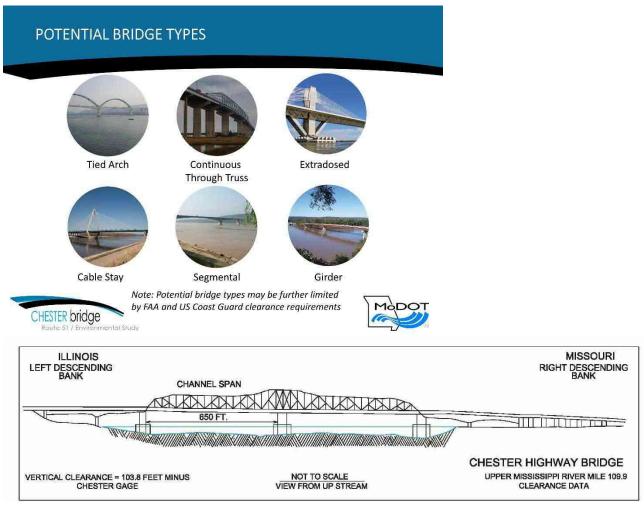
Potential Bridge Types and Existing Bridge Configuration
